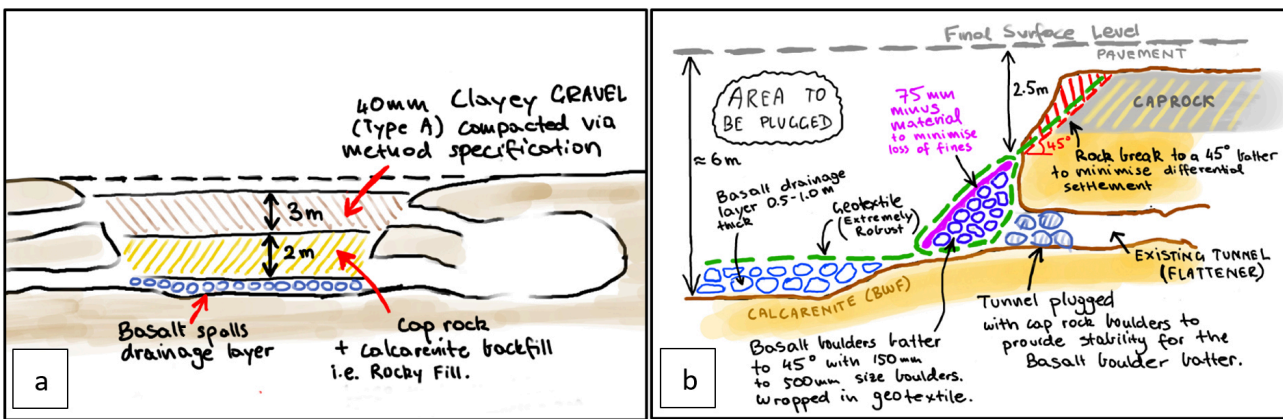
Backfill 'plug' materials (a), Design details at excavation base and perimeter (b)
